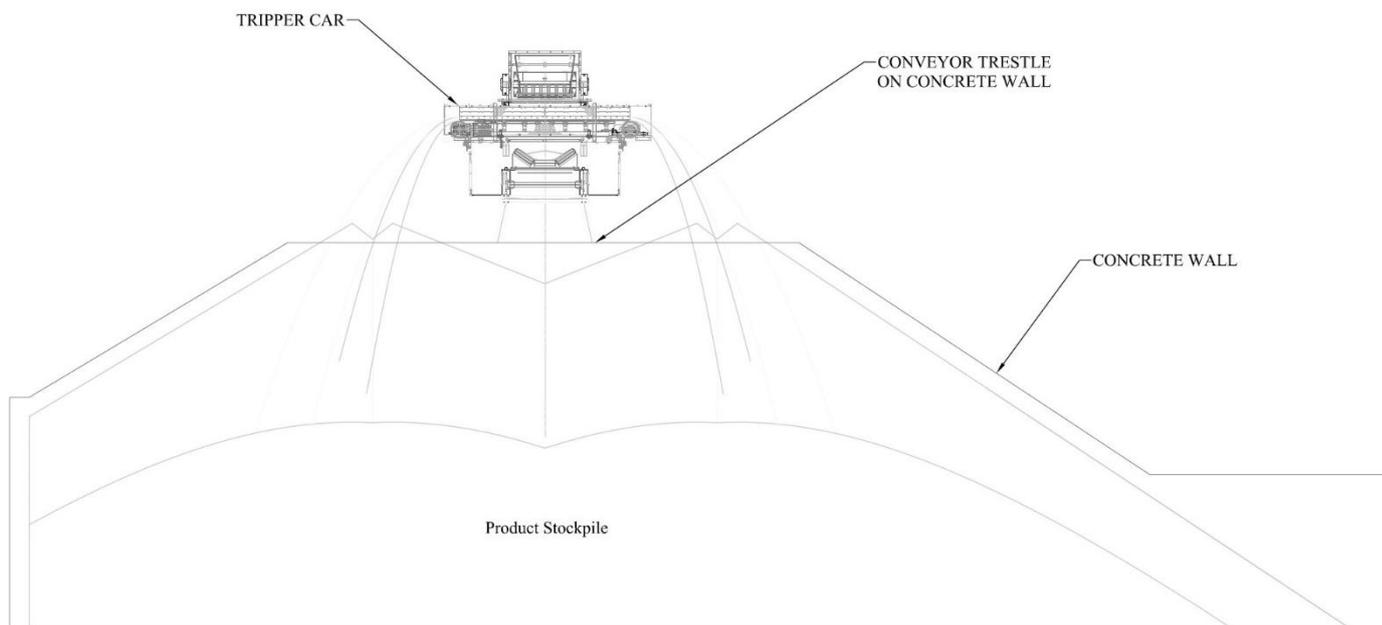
Cross-section of handling facility bunker – St Peters Terminal
